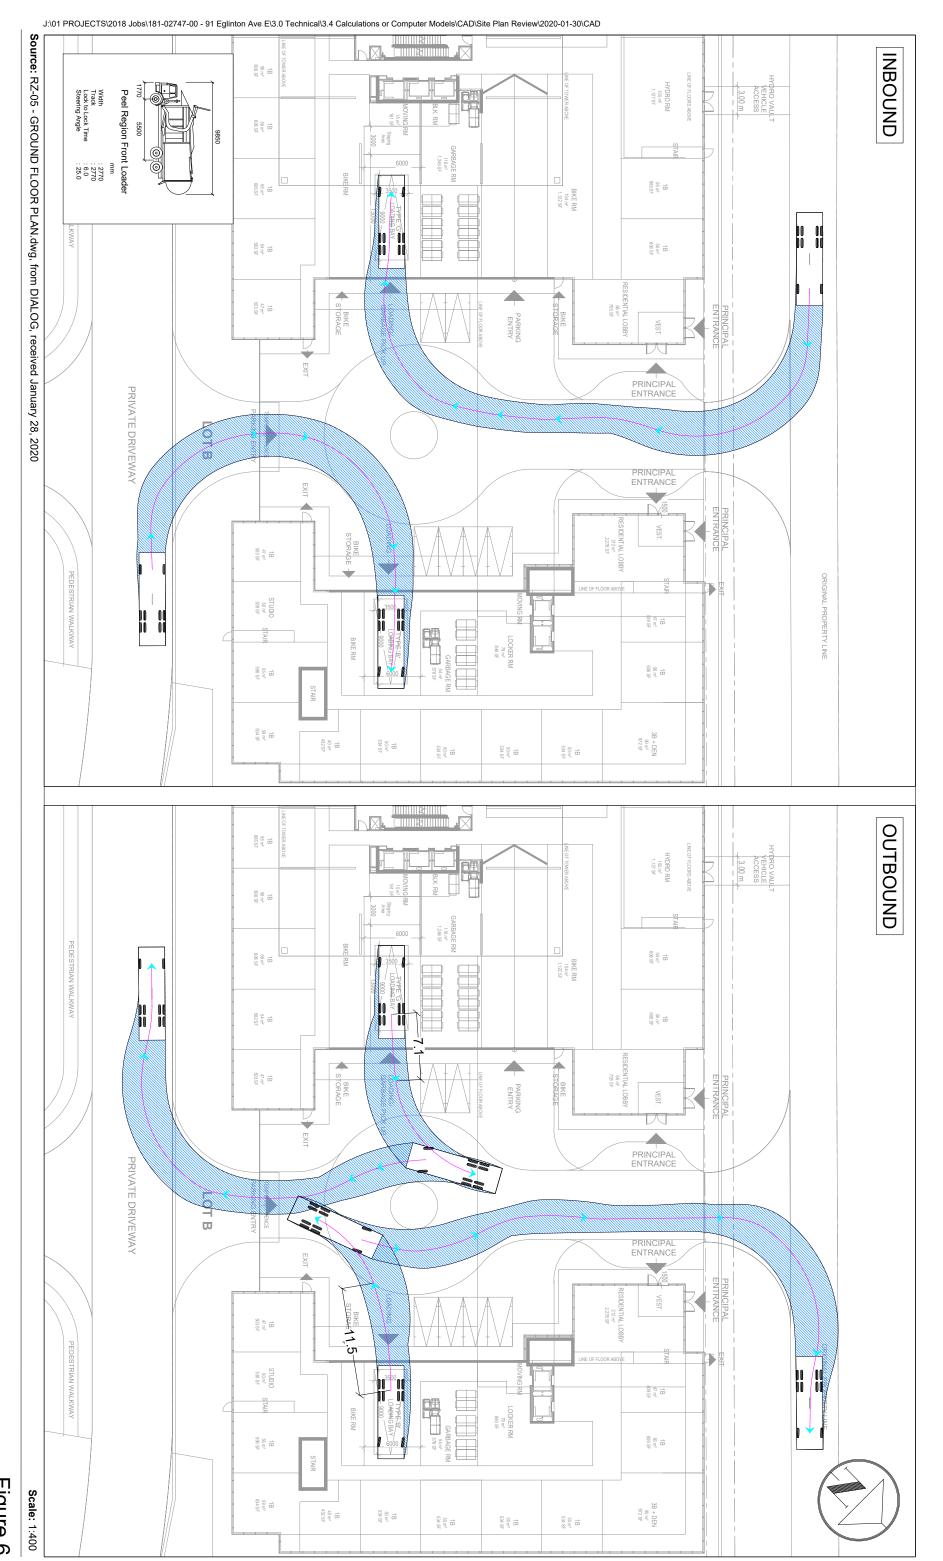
Front Loader Garbage Truck Manoeuvres on Lot B 91 Eglinton Avenue East - Updated Site Plan Memo
